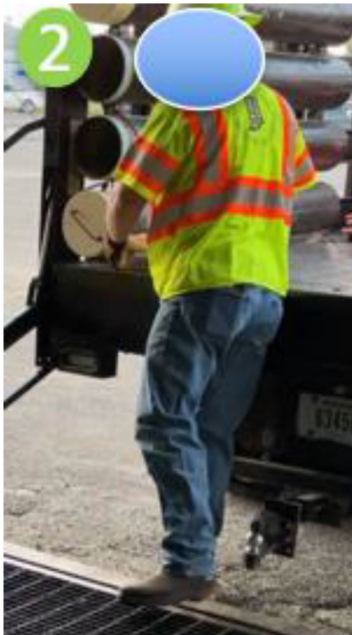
Lifting bags of dry concrete mix alternative—step two.
